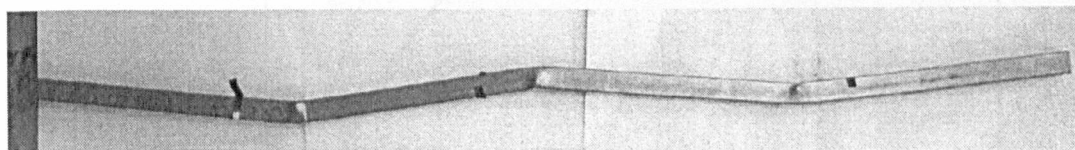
Failure mode of SHS 50×50×3-1 - configuration: 1/2 span
